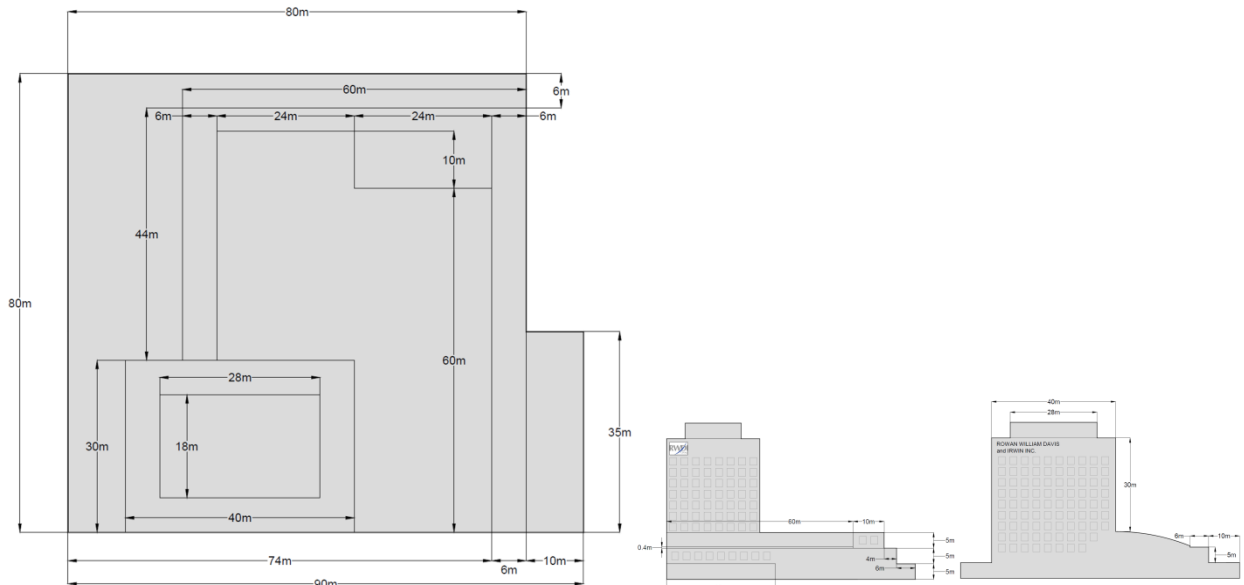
Plan and elevation views of the SPACE model building. Dimensions are provided in full-scale meters (Brooks et al 2015).
